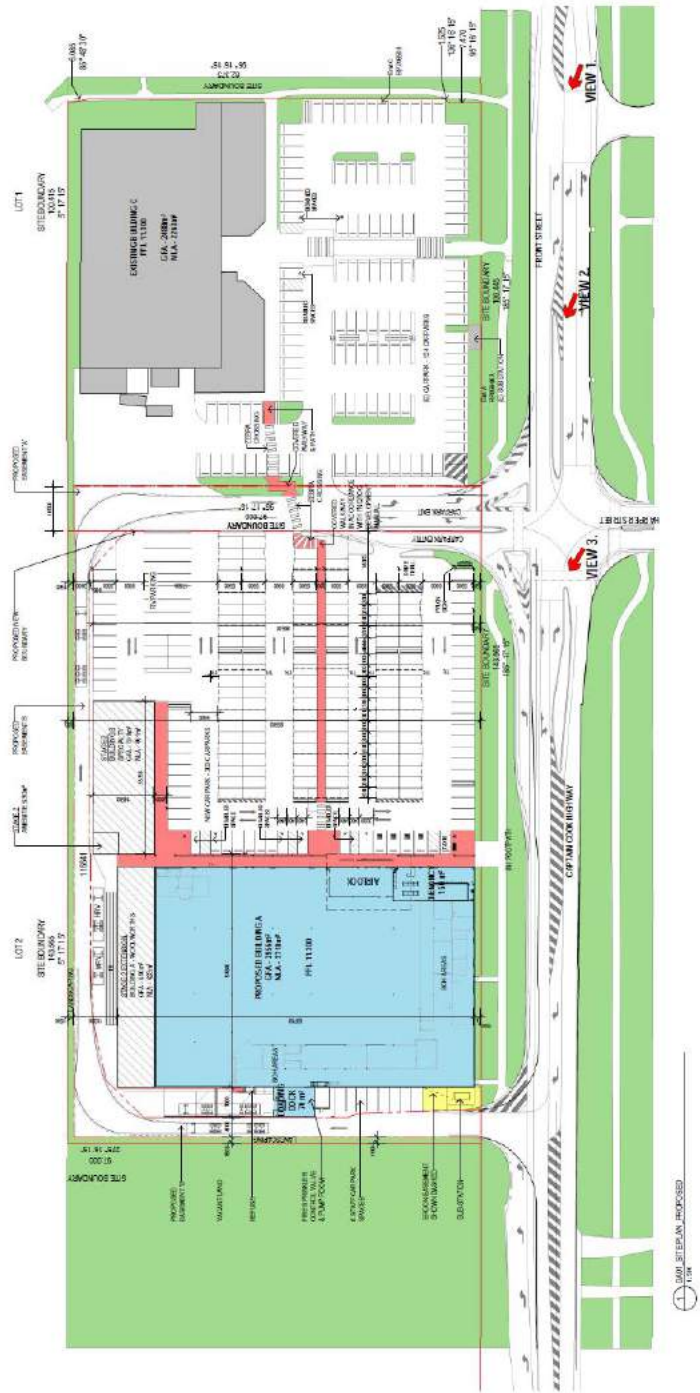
Issue E - Plan illustrating extent covered walkway
